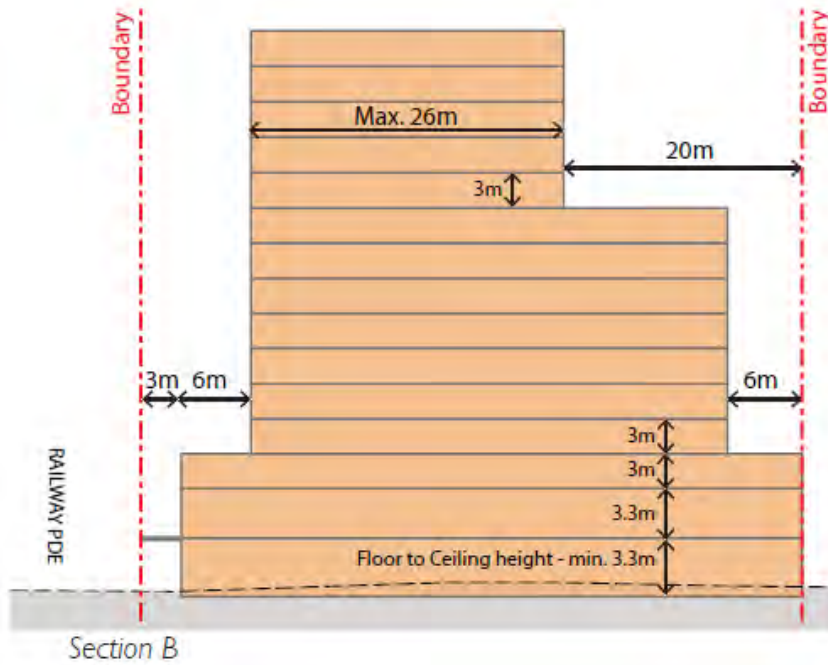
North-South Section of Site Building Envelope
